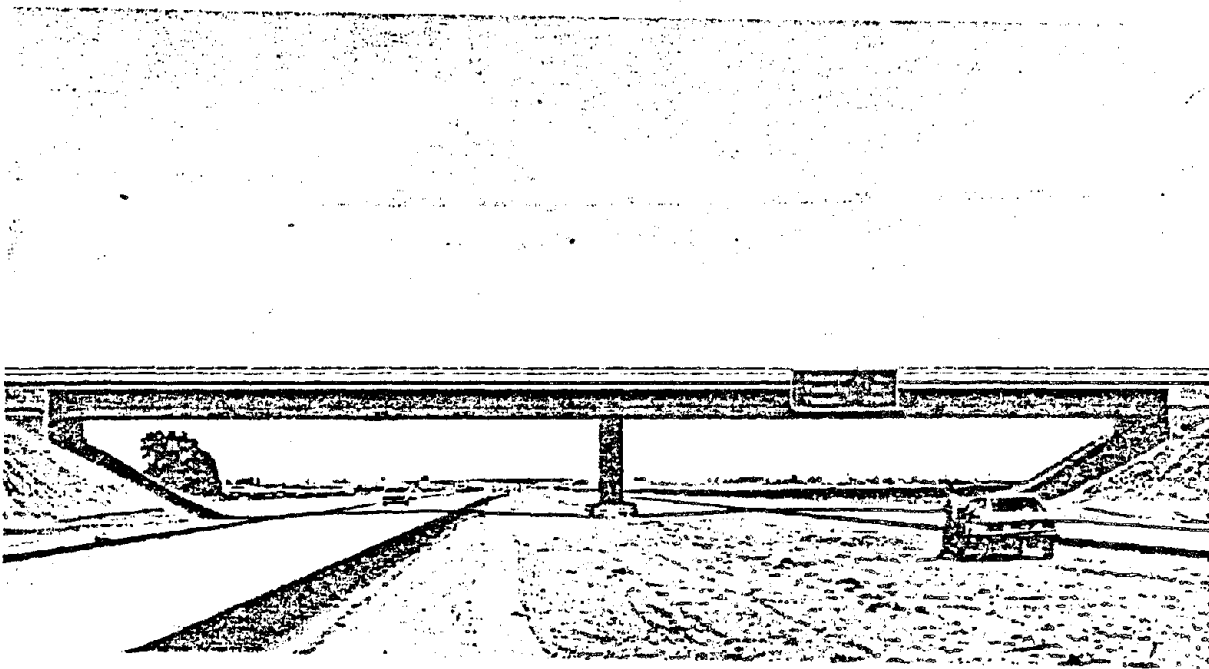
VIEW OF MELOLAND ROAD OVERPASS LOOKING EAST
